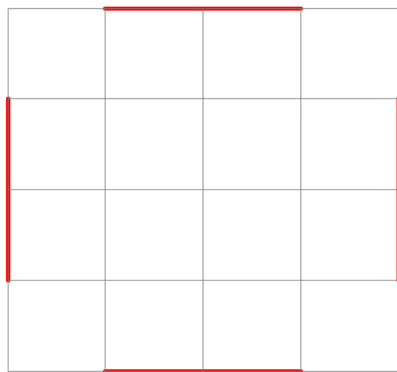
(a) Structural Plan for X-braced RC Frame (Model-2)
